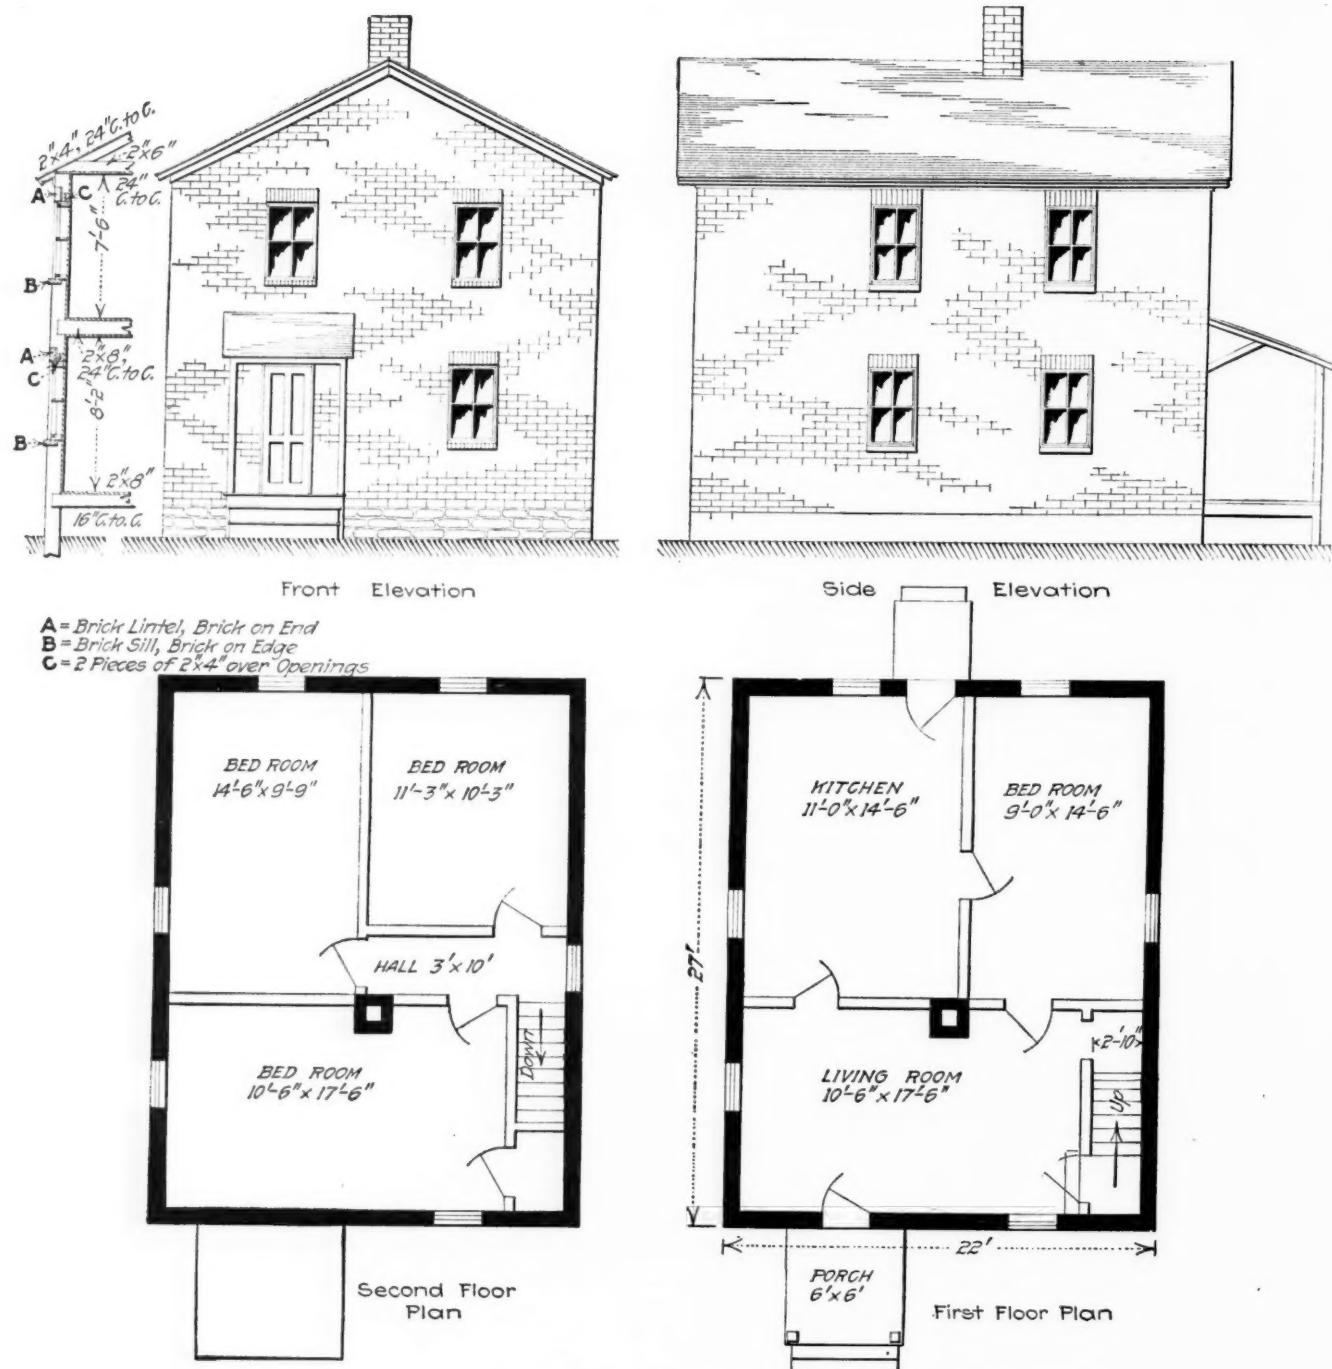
DETAILS OF CONSTRUCTION OF TWO-STORY, SIX-ROOM TILE HOUSE
